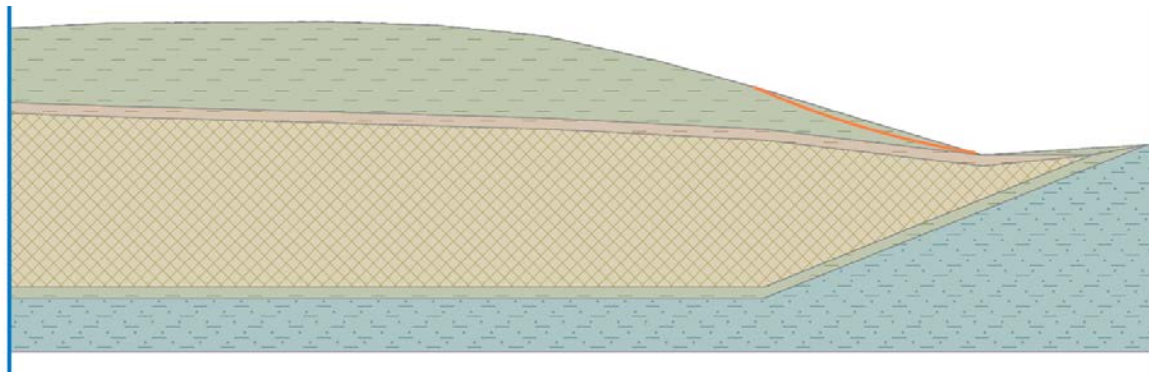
Section 1-1, $r_u=0.1$, shallow slump
